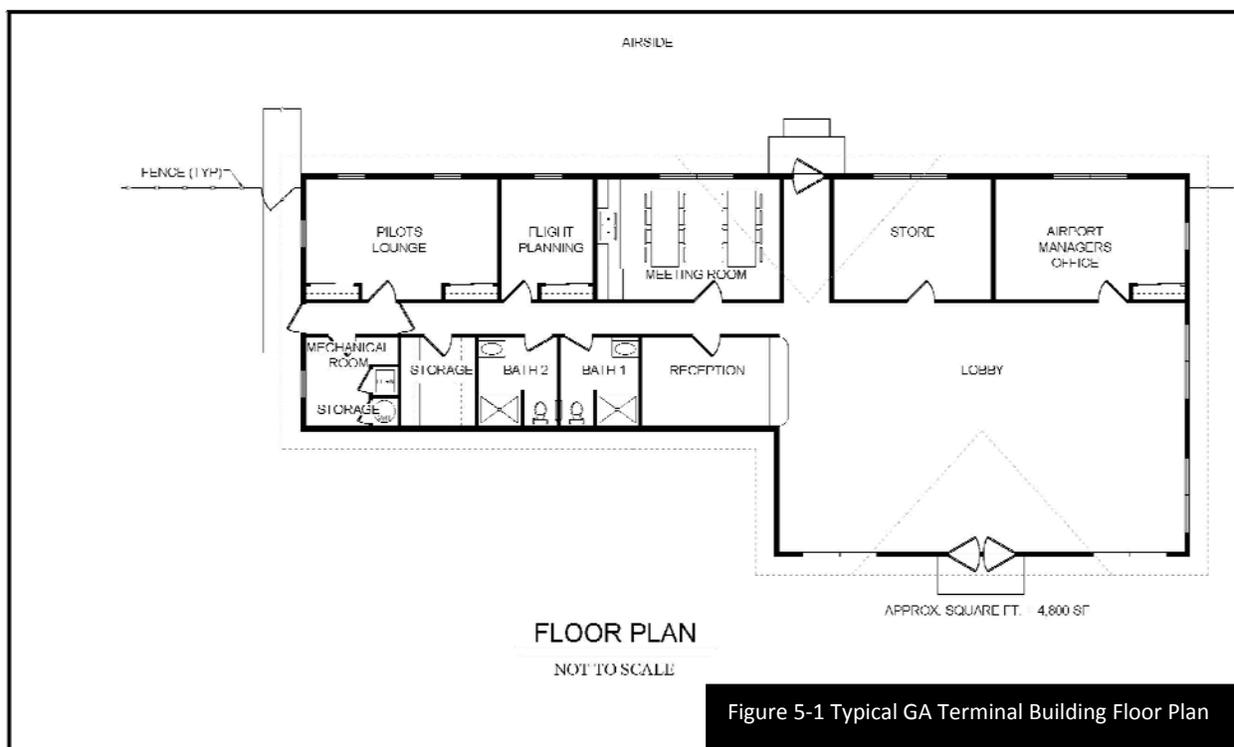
depicts a typical conceptual floor plan for a terminal building at a general aviation airport. The floor plan most suitable for Cochise County Airport would be developed in greater detail in the project design phase. In general, a terminal building for a general aviation airport should include the following:
